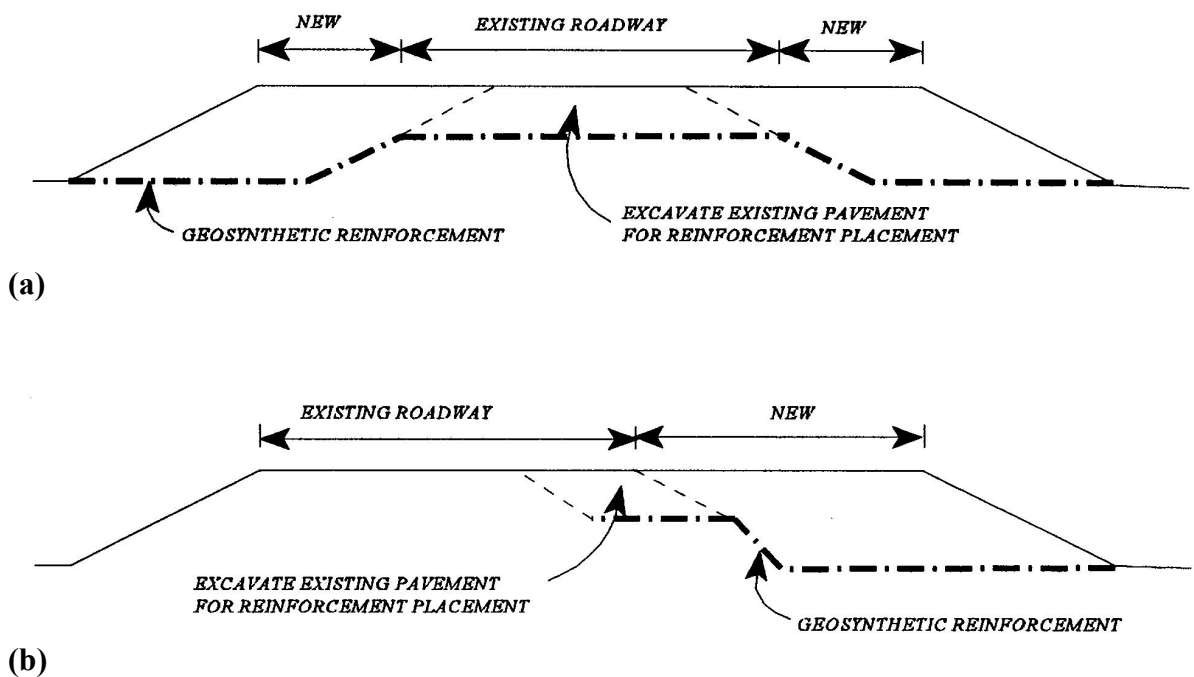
Reinforced embankment construction for roadway widening; a) fill placement on both sides of existing embankment; b) fill placement on one side of the existing fill.
